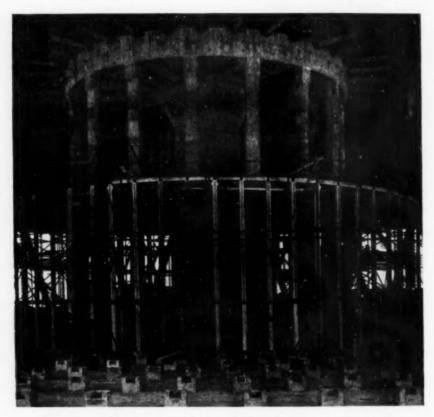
Cooling Tower: Precast Concrete Posts and Sole Pieces for Cooling Stack.
